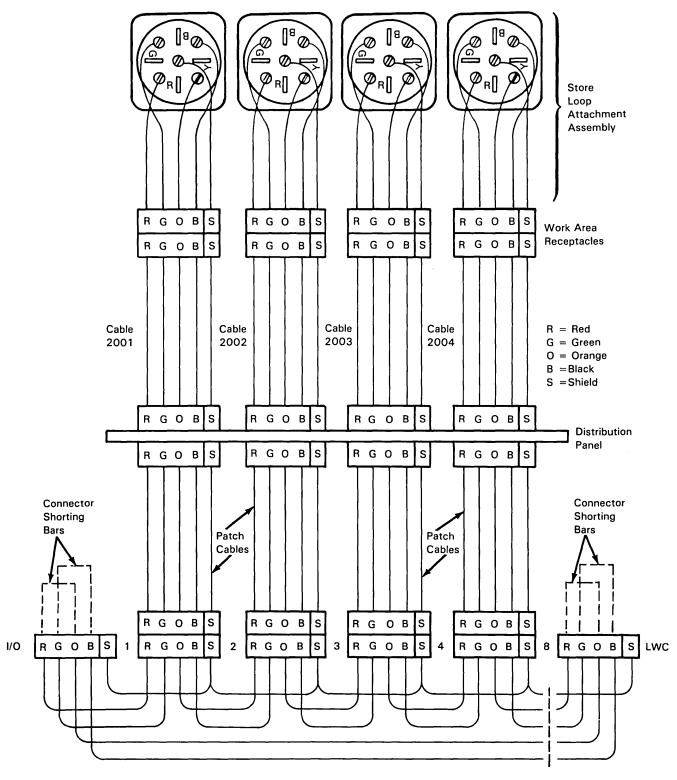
Schematic of an Installation Using Store Loop Attachment Assemblies
